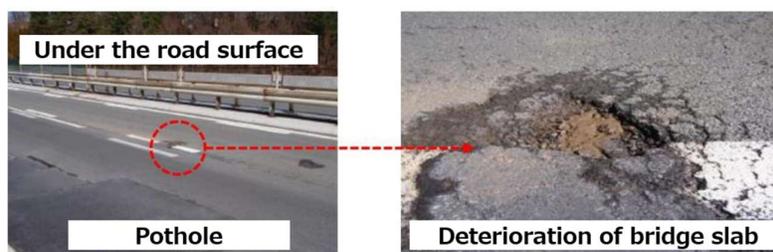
Examples of pavement damage caused by concrete slab deterioration
